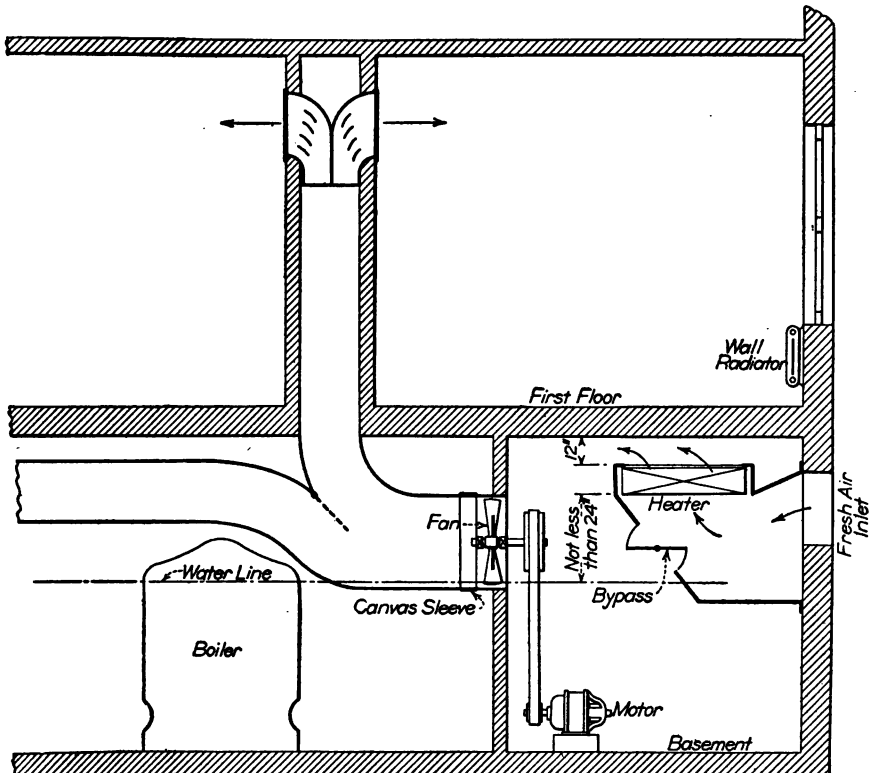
TYPICAL ARRANGEMENT OF HEATING AND VENTILATING SYSTEM SUITABLE FOR USE IN SMALL SCHOOLS
